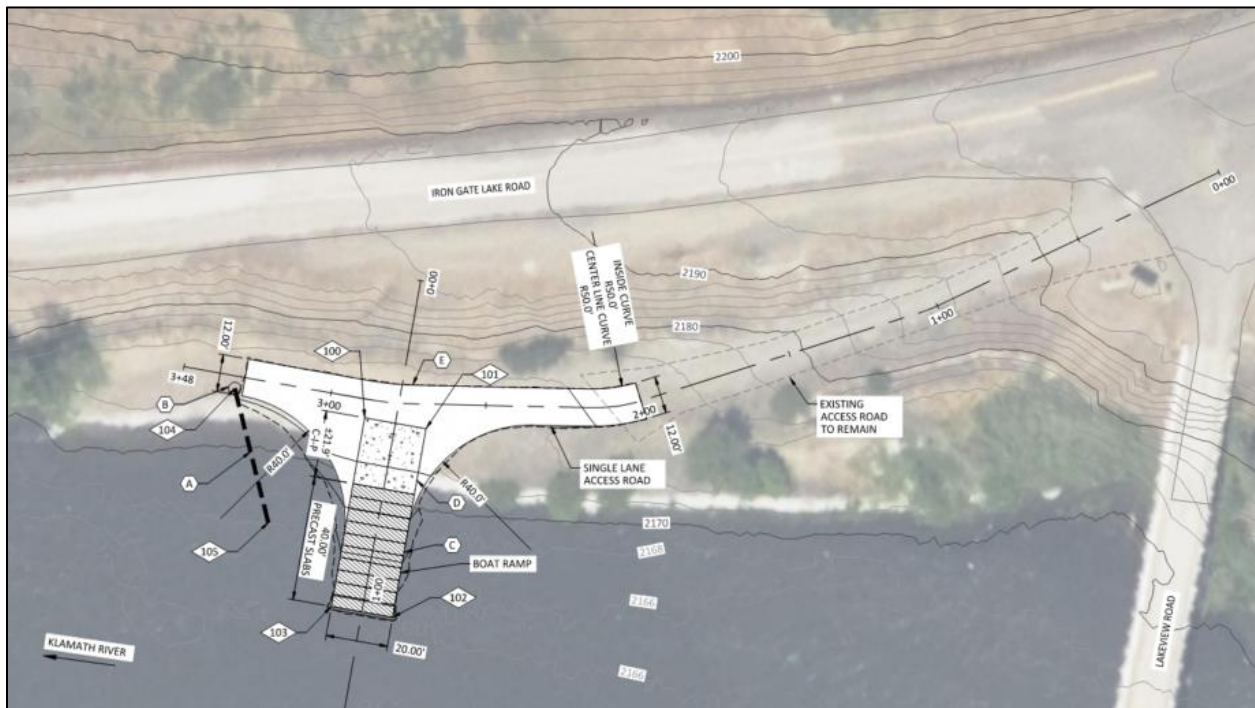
Iron Gate Boat Ramp and Dry Hydrant
